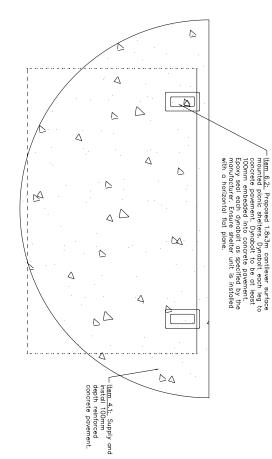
DETAIL Scale: - SURFACE MOUNTED SEAT UNIT
